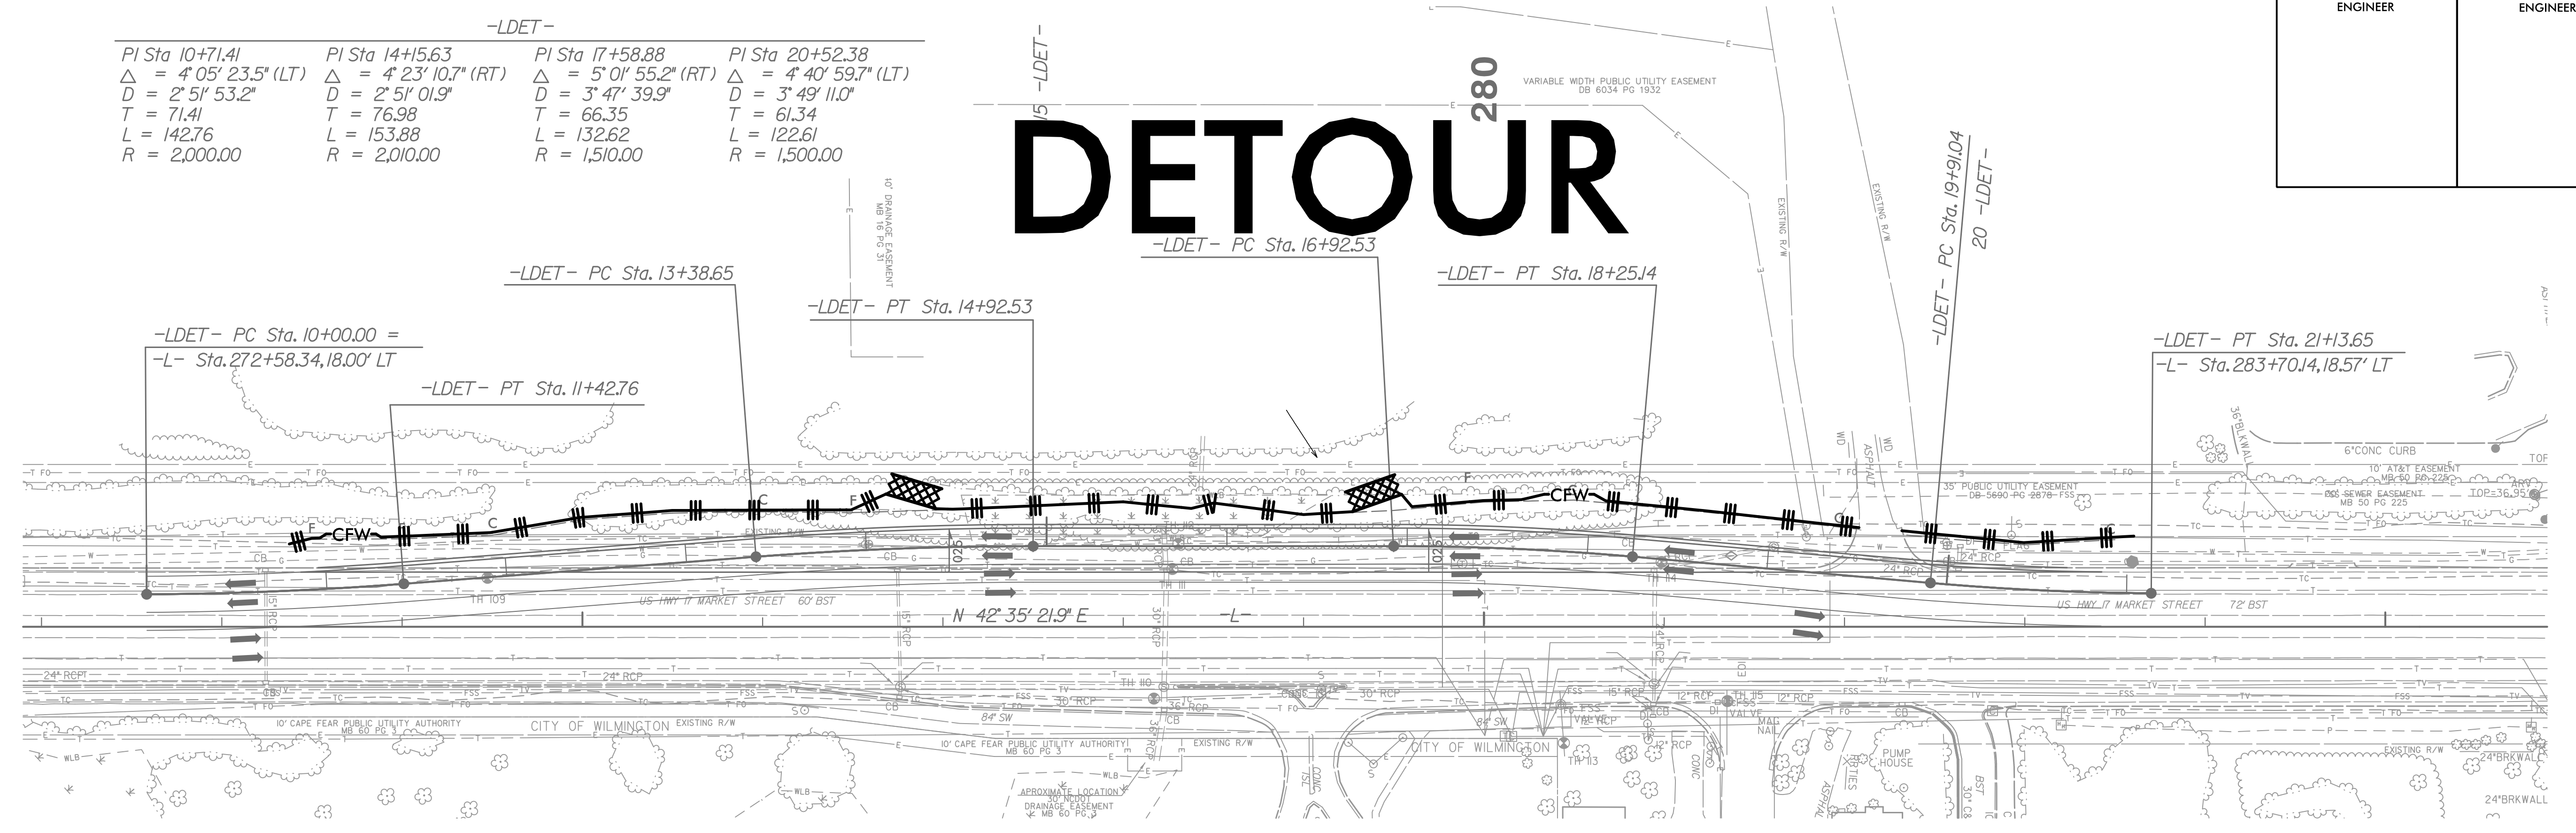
# DETAIL OF TEMPORARY WIDENING FROM STA -L- 273+44 TO STA -L- 283+54
